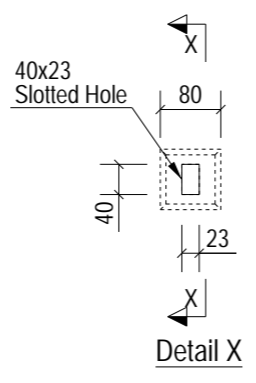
BYL-1462-YD-0005-GA1 Rev: C01
